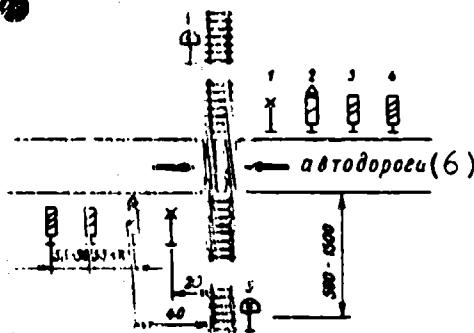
Plan for Positioning Road Signals and Signs at an Unguarded Crossing
